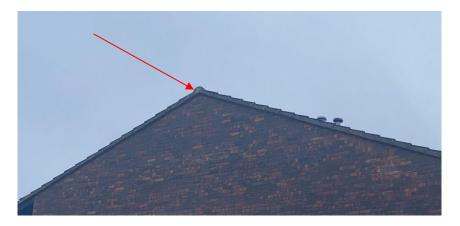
Missing mortar on the ridge tile (Northern Elevation)
